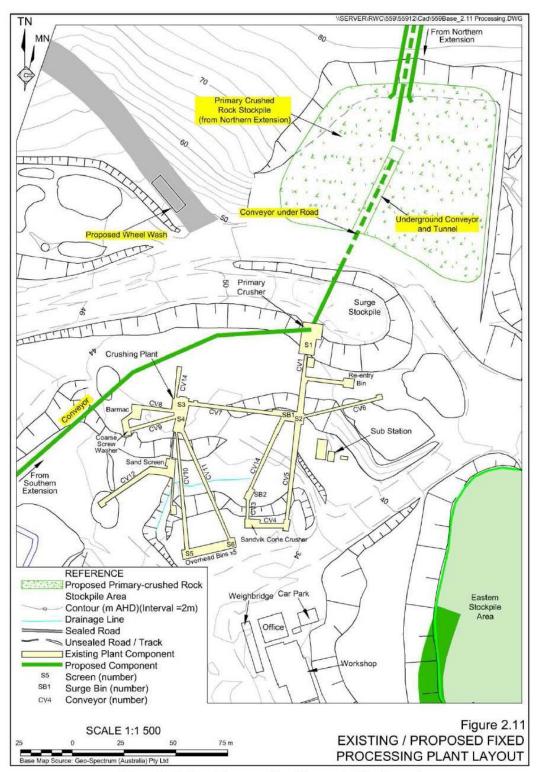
Existing / Proposed Fixed Processing Plant Layout
